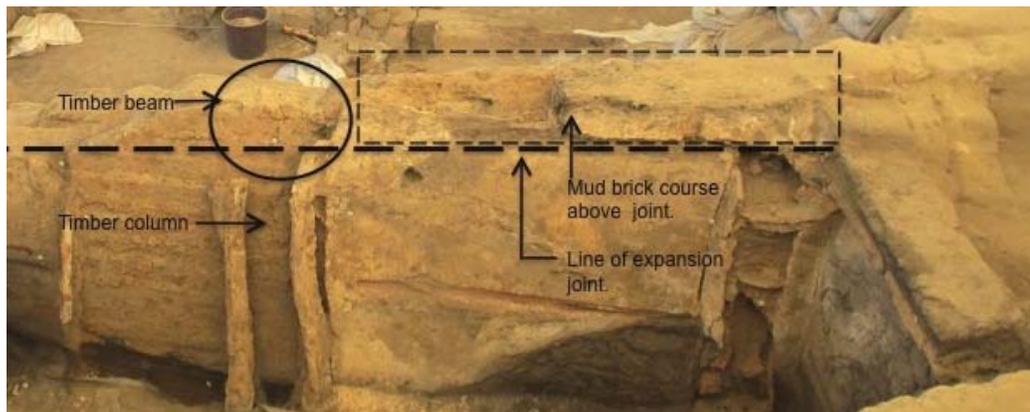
Inferred location of timber beam supported by timber column; and line of proposed expansion joint.
